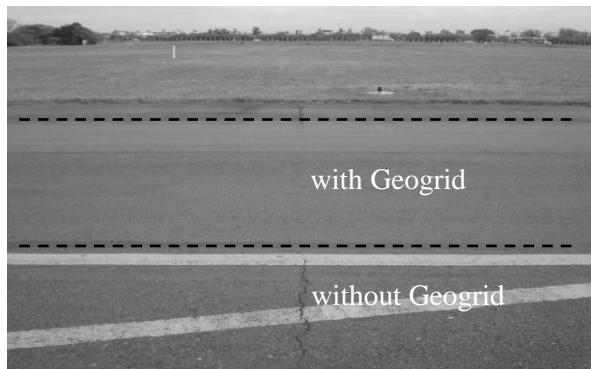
Joints of the Concrete Slabs Reflect in the Area Where No Reinforcement Was Used
